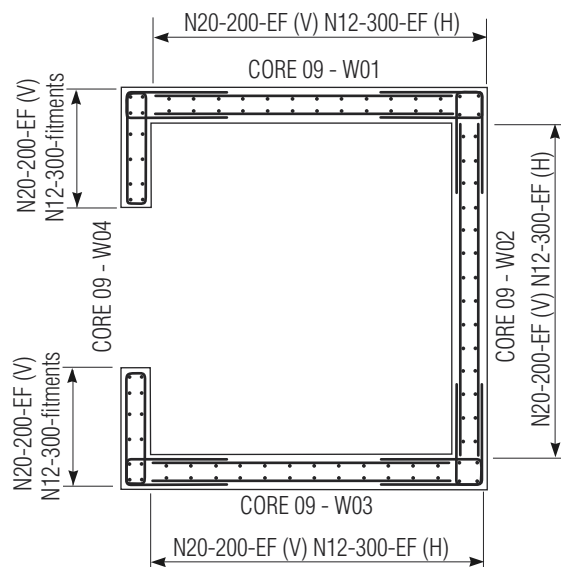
This figure shows a section of a lift shaft with reinforcement on both faces including the corner details, etc.
